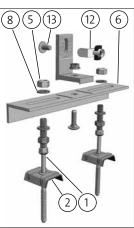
Solar fastener with storm washer and angle flange
